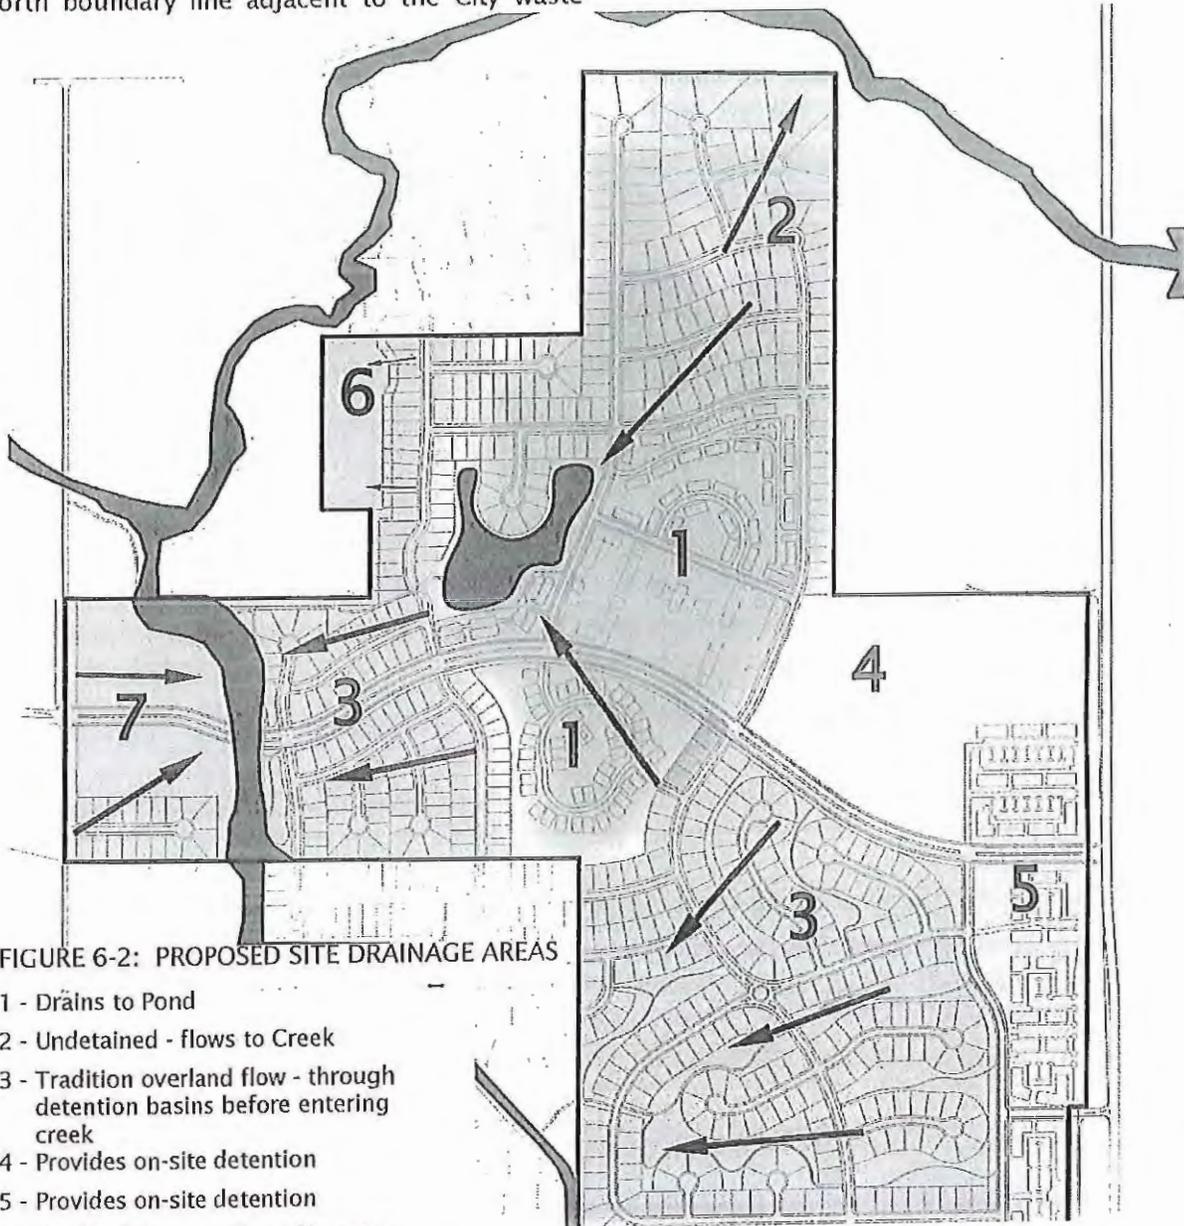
PROPOSED SITE DRAINAGE AREAS
